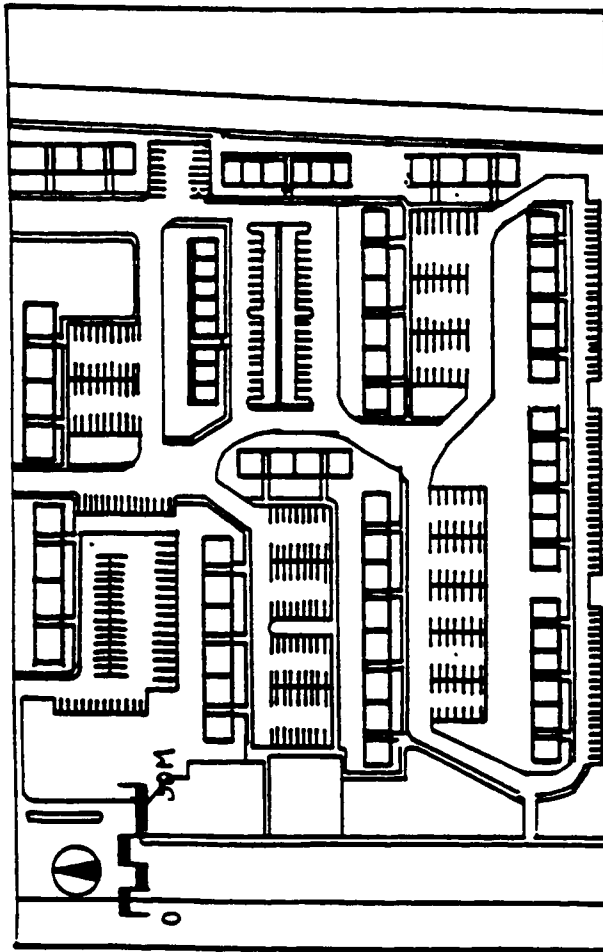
Site layout plan of Jamsil Usung apartment complex
